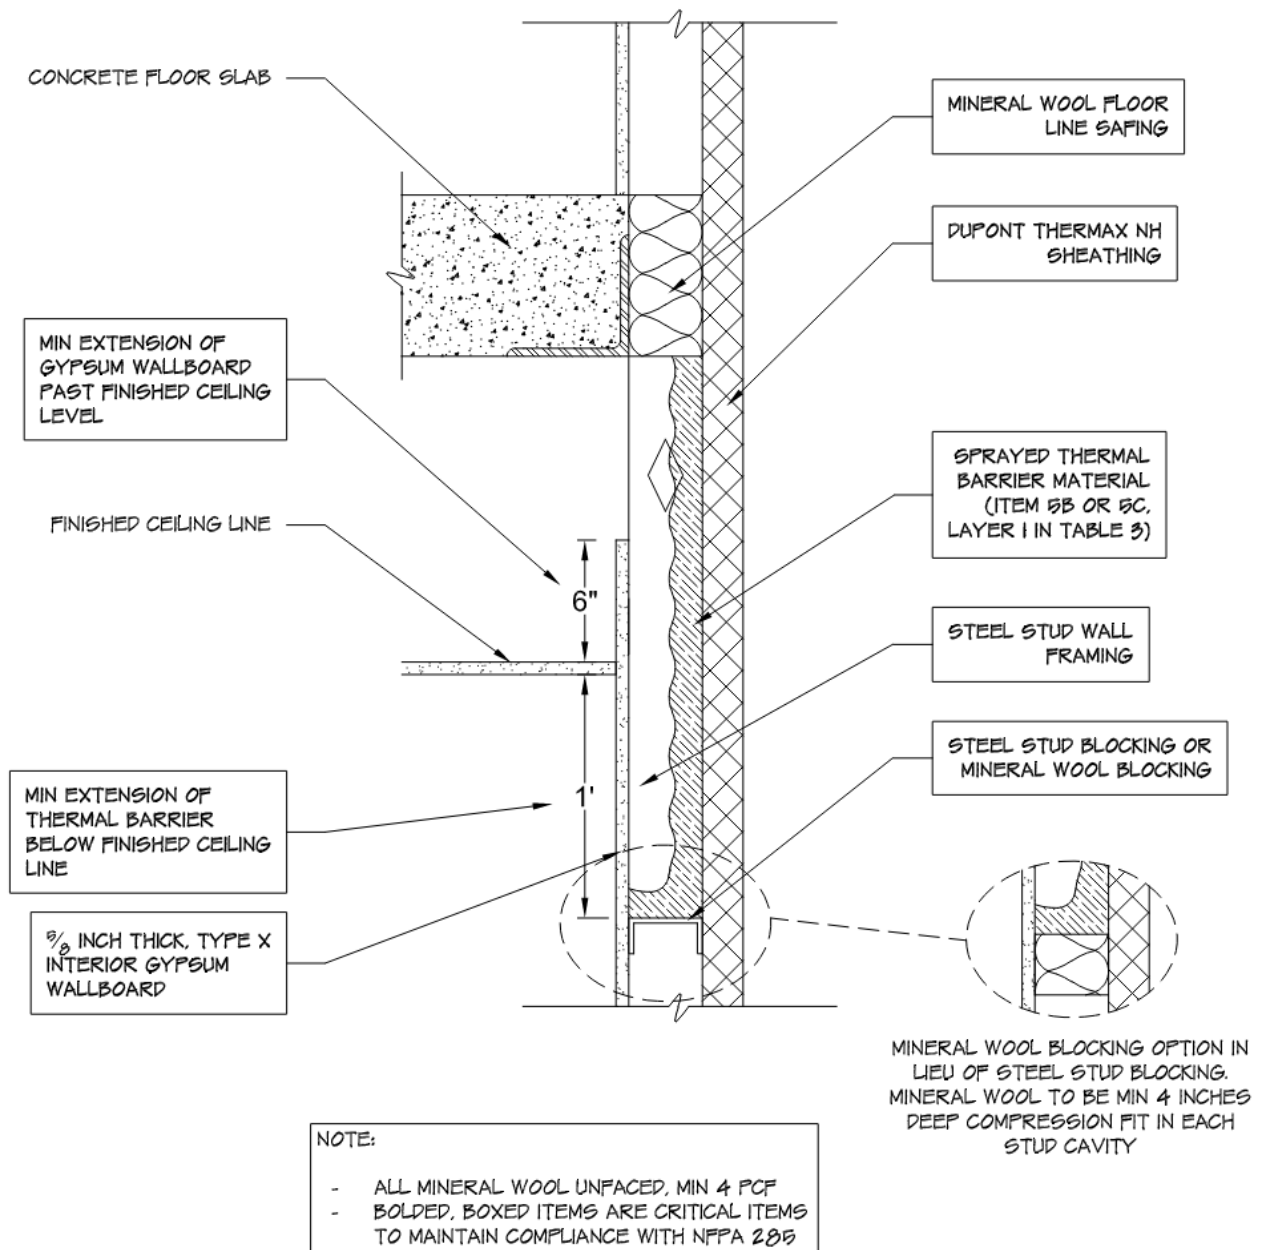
Transition detail from interior gypsum wallboard to sprayed thermal barrier material above ceiling line.
